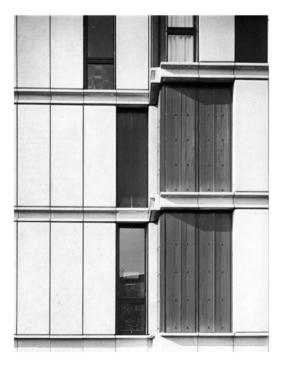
Prefabricated panels of façades (Archive Angelo Mangiarotti, Milano).
